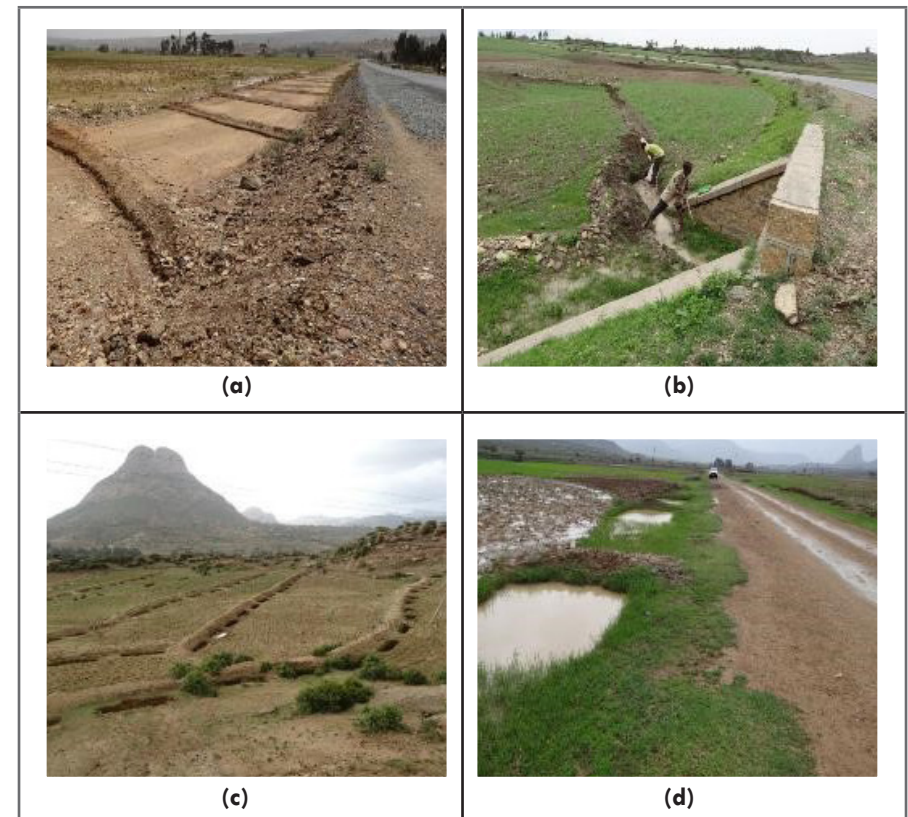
(a) Flood water spreader from paved road surface (b) Flood water spreader from culverts (c) Infiltration trenches fed by road water (d) Road side infiltration trenches – all pictures from Ethiopia.
